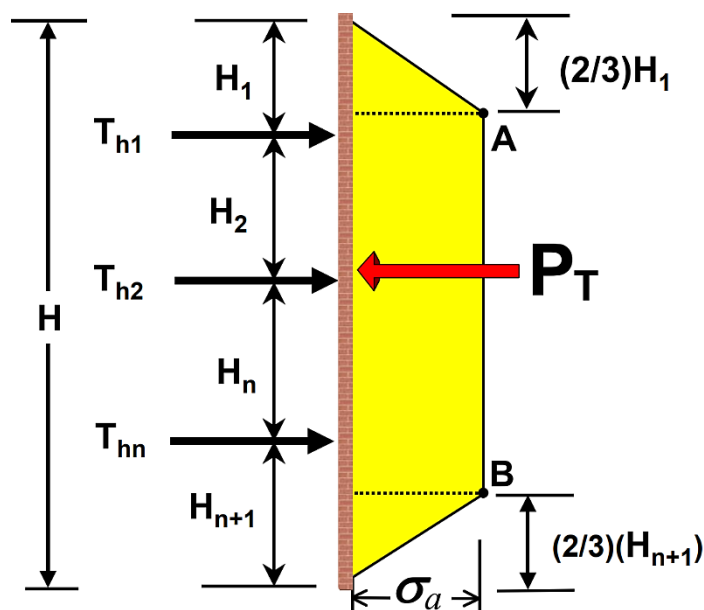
Pressure Diagram for Multi-Anchored/Braced Wall in Cohesionless Soil
